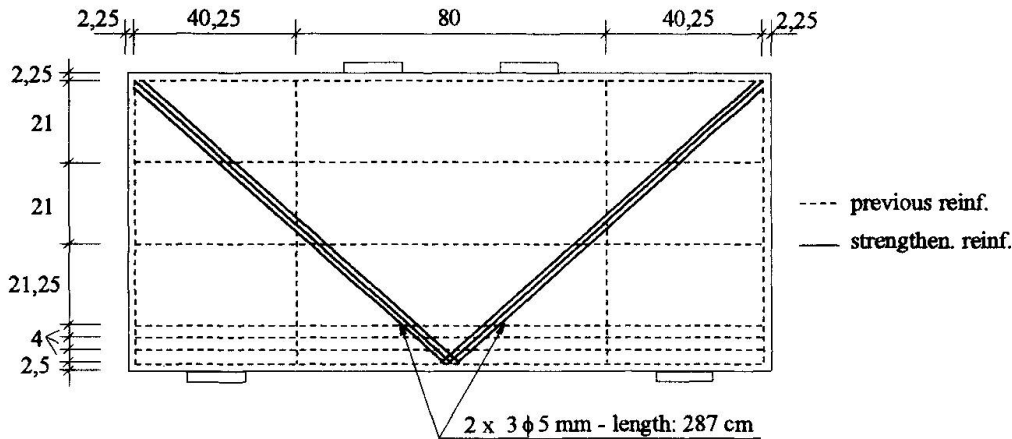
Beam 5/S strengthening reinforcement detail (cm)
